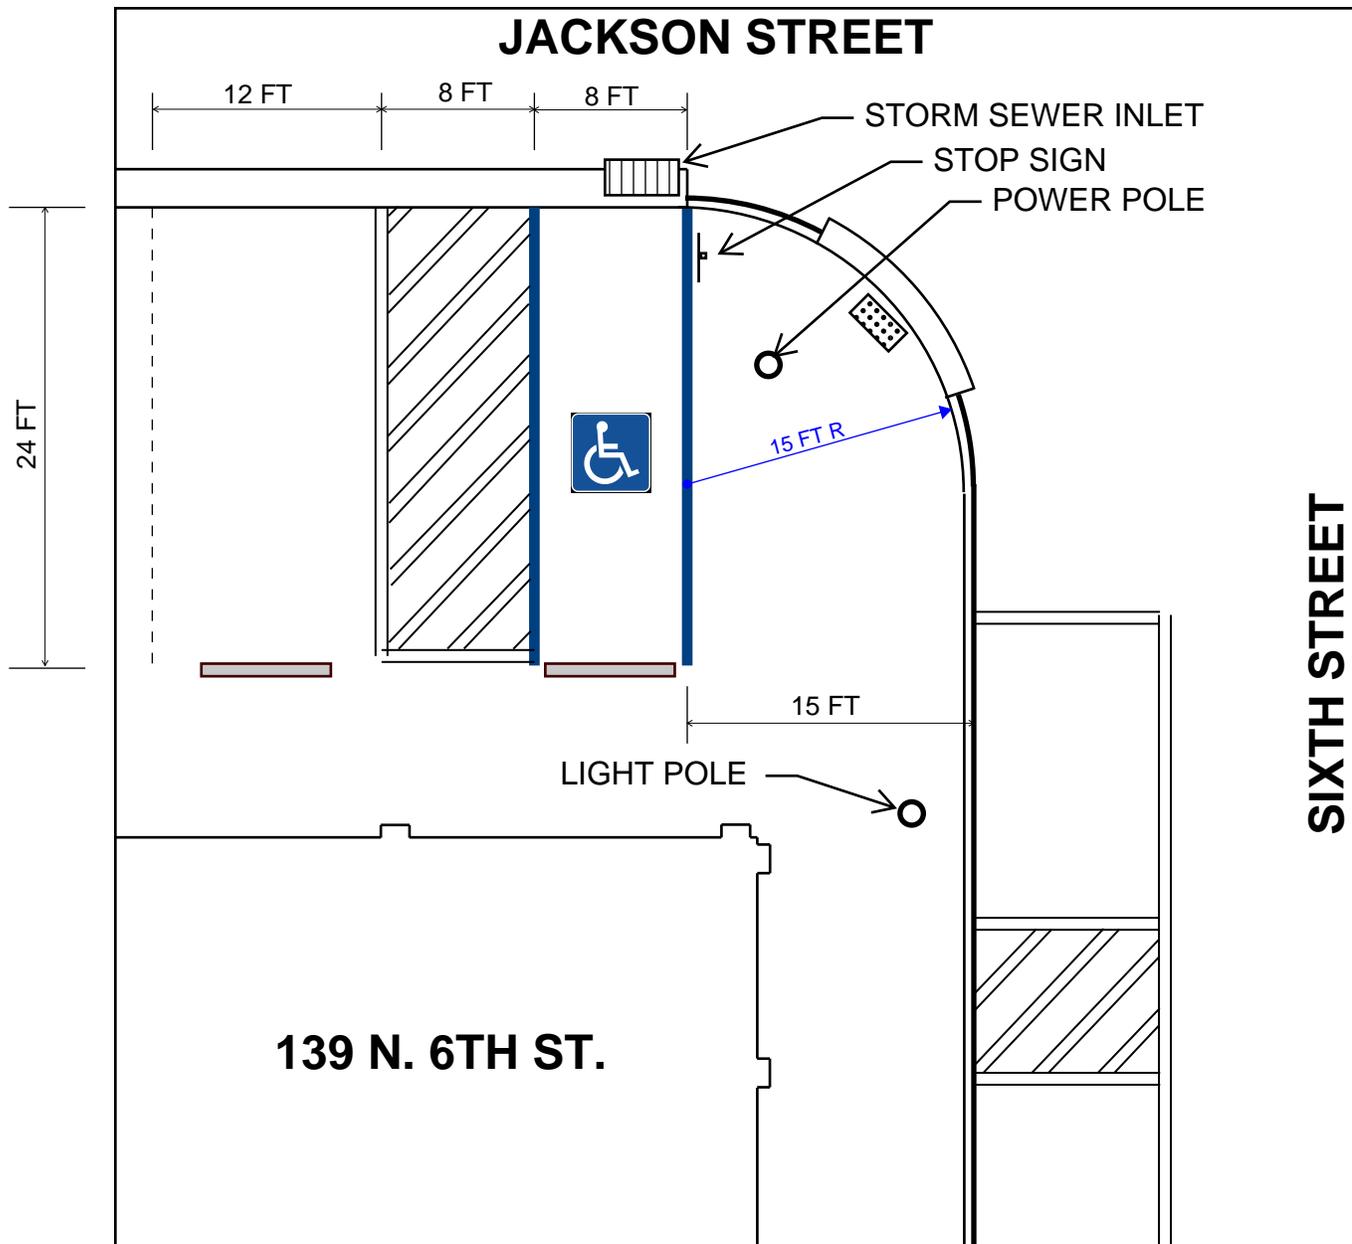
VAN ACCESSIBLE HANDICAPPED PARKING STALL ON THE SOUTHWEST CORNER OF THE INTERSECTION OF JACKSON ST. AND 6TH ST.
